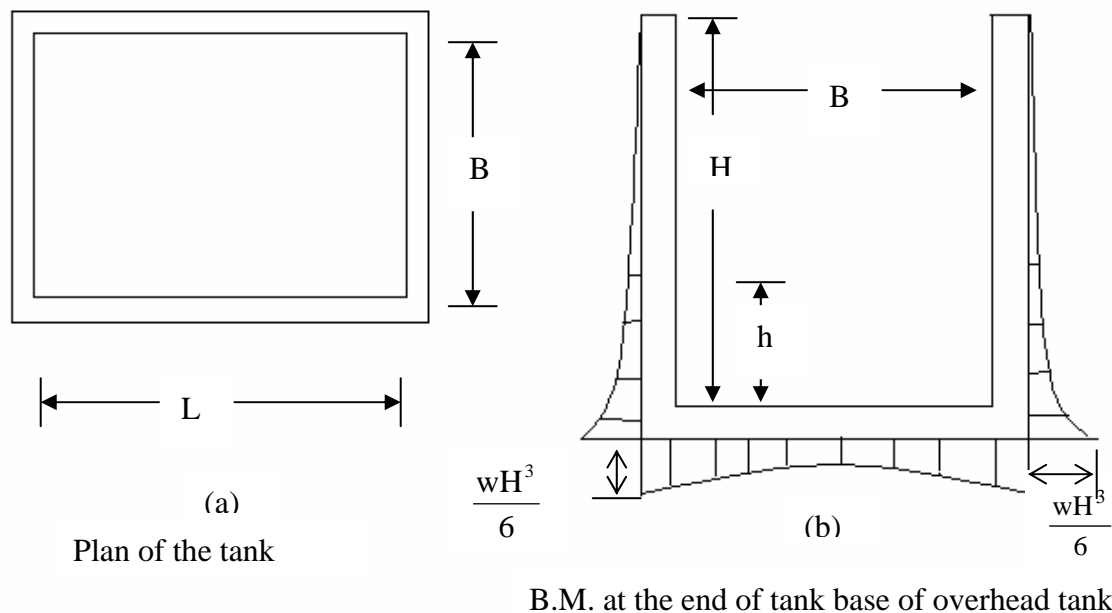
Plan and Bending Moment Diagram of Rectangular Tank
